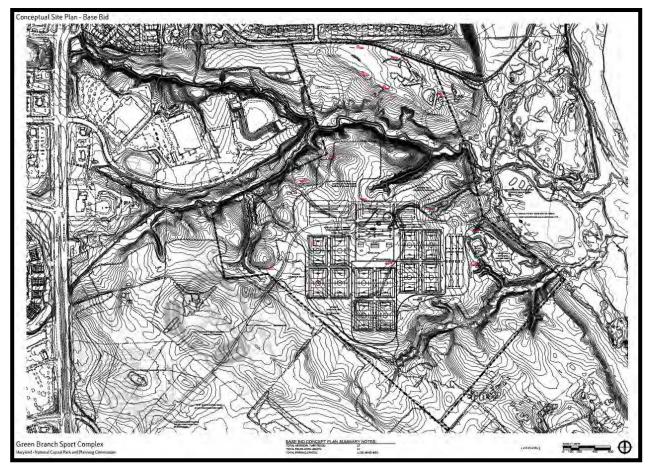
Conceptual Site Plan (Dated: 12-10-2013)
